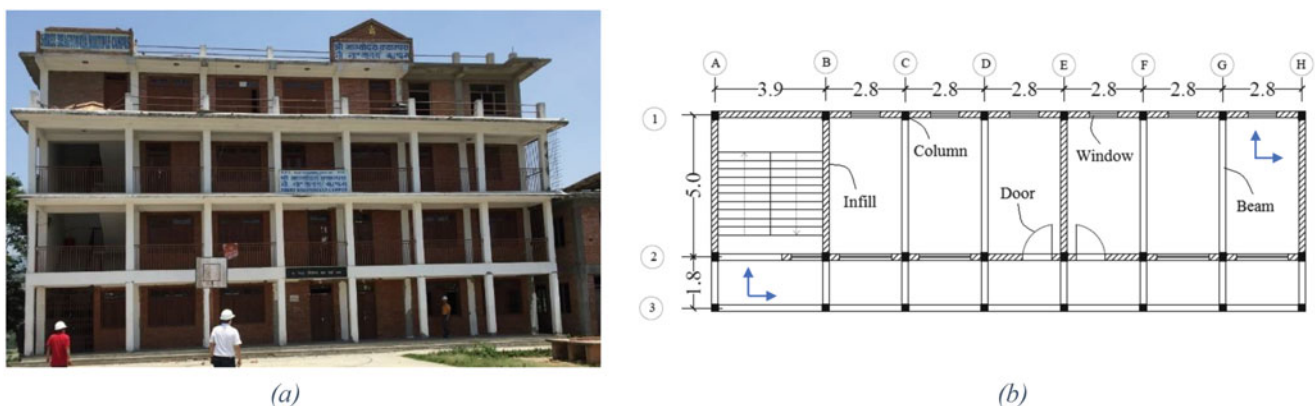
Four-story school building (a) elevation view (b) plan view and location of sensors
